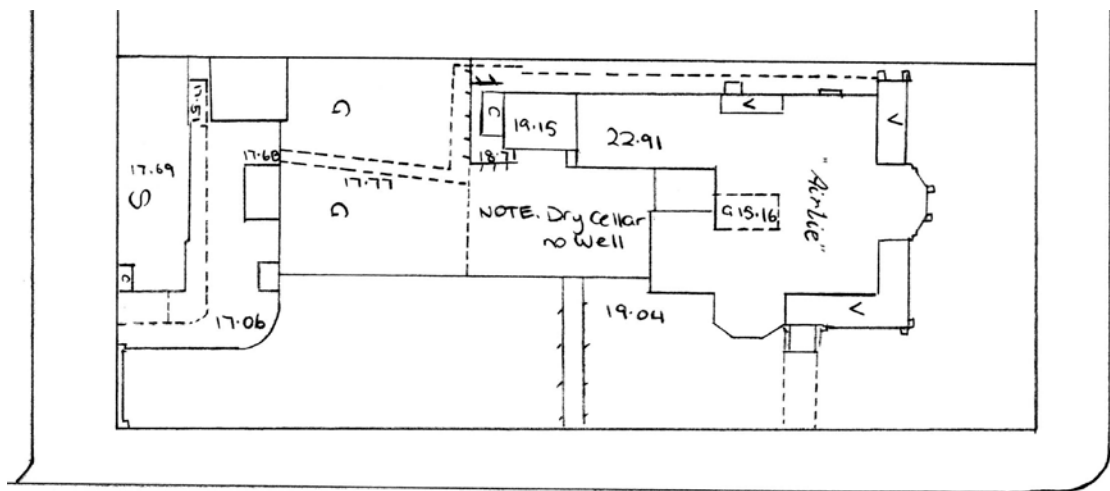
MMBW plan 40" to 1', South Melbourne Detail Plan of Airlie, 1895.
